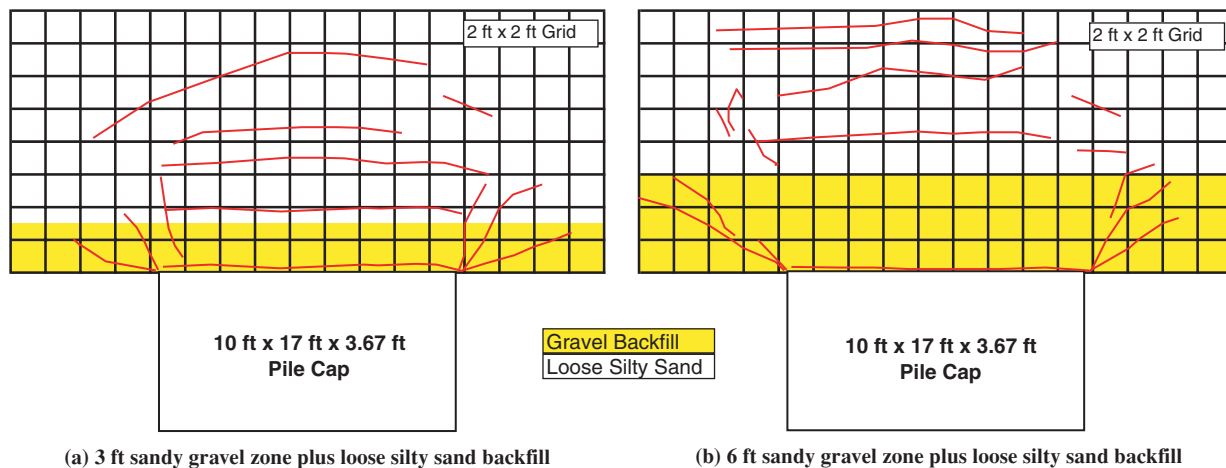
Plan view of crack patterns behind a pile cap after excavation and replacement of loose silty sand with (a) a 3-ft and (b) a 6-ft zone of compacted sandy gravel behind the pile cap.
